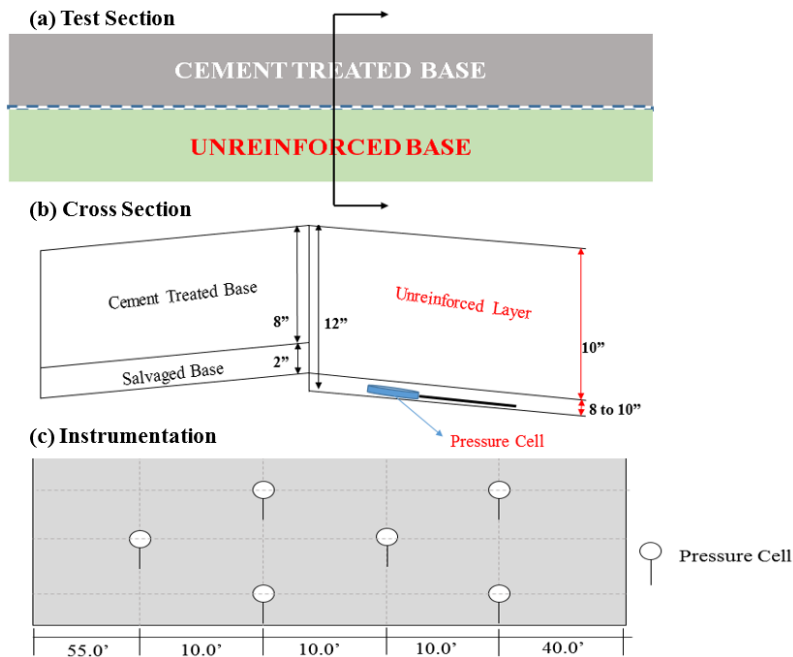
Cross Section and Instrumentation of FM 906 at Testing Site for Unreinforced Section.
